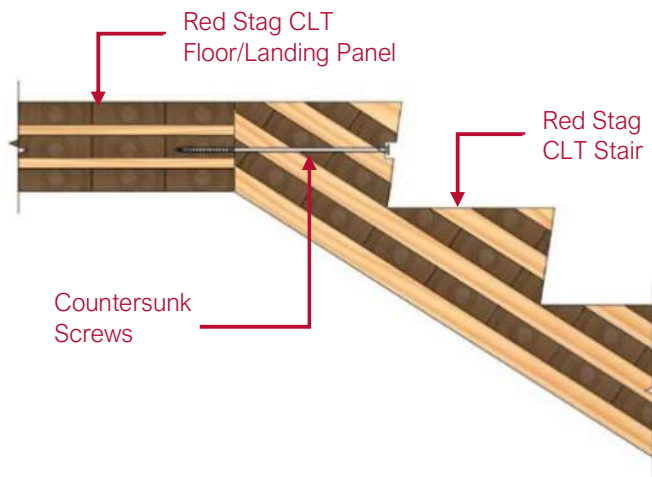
Red Stag CLT stair panel to CLT landing/floor panel connection.
